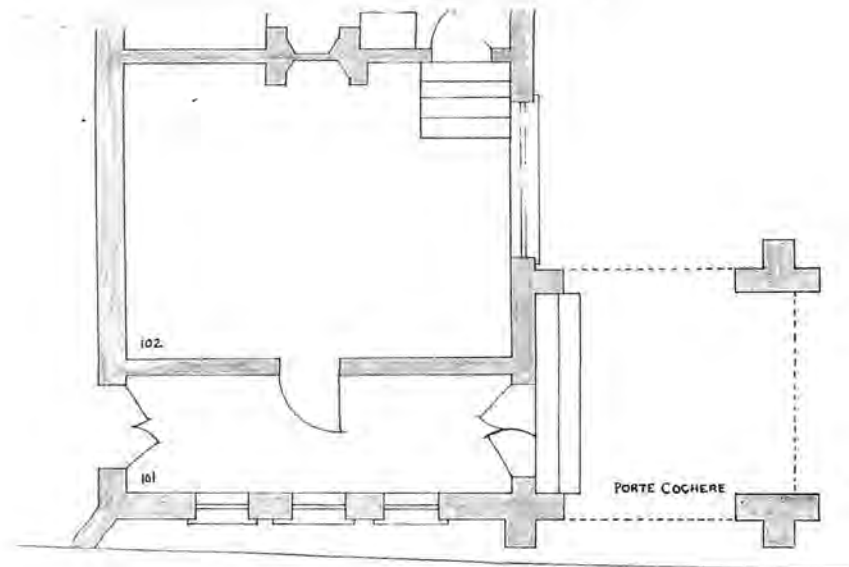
Floor plan showing convenient entrance through room 101, the porte cochere.
